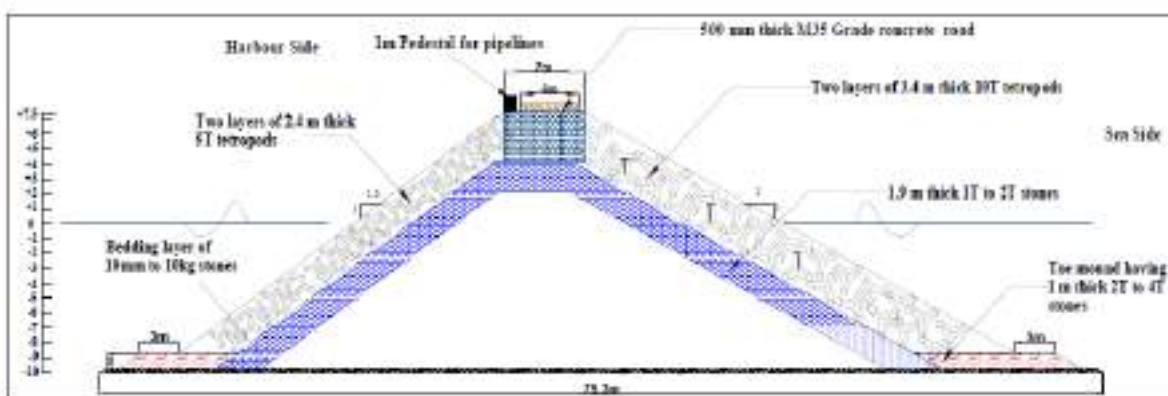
Typical breakwater trunk section for water depth of 8m to 10m
